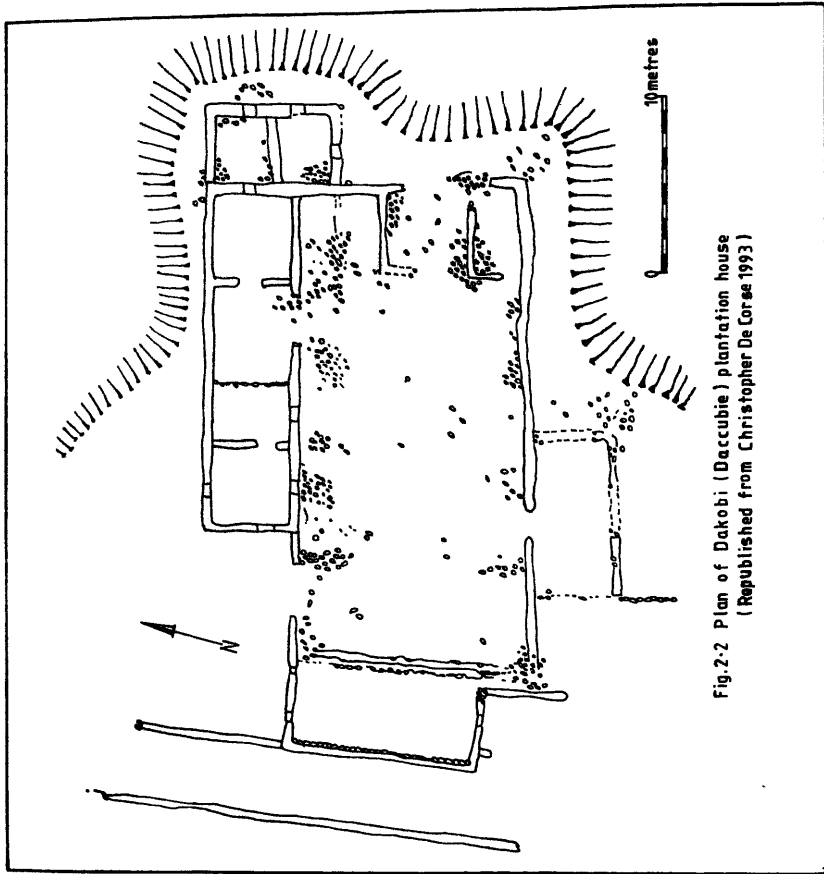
Plan of Dakobi (Daccubie) plantation house
